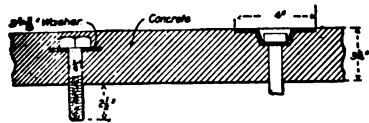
Sections of Floor Panel with Bolt and Washer Hanger.
